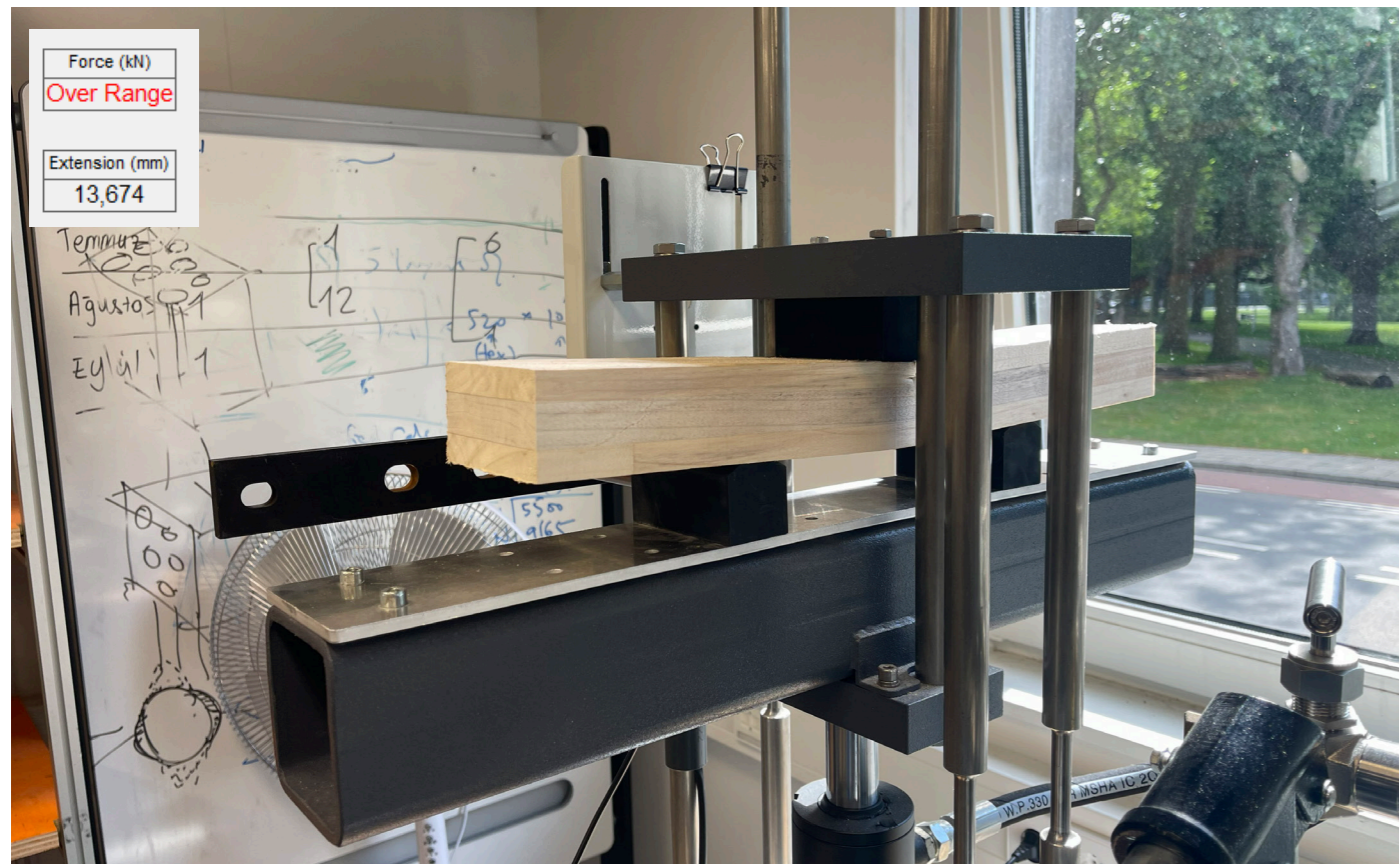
First terminated test in which the test bench reached its maximum load without causing failure
